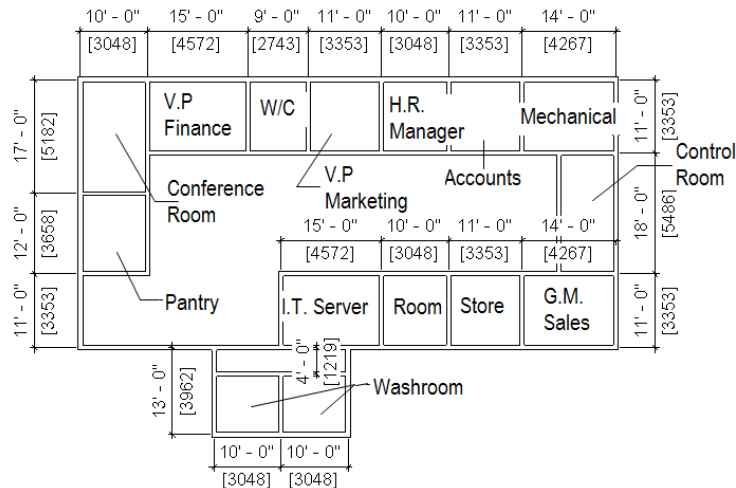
Sketching plan for creating exterior walls for the Office Building
